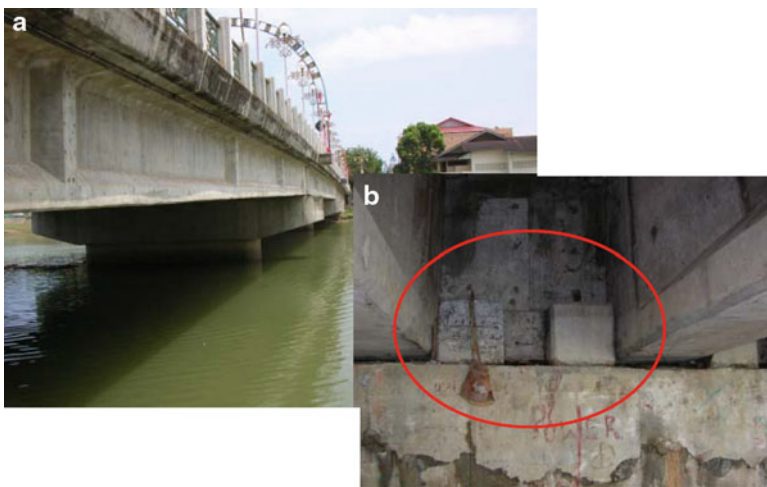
Concrete bridge survived from the tsunami (2004 Sumatra offshore earthquake and tsunami at Banda Aceh) (a) Concrete bridge girder. (b) Concrete stopper for prevention of lateral movement of girders
